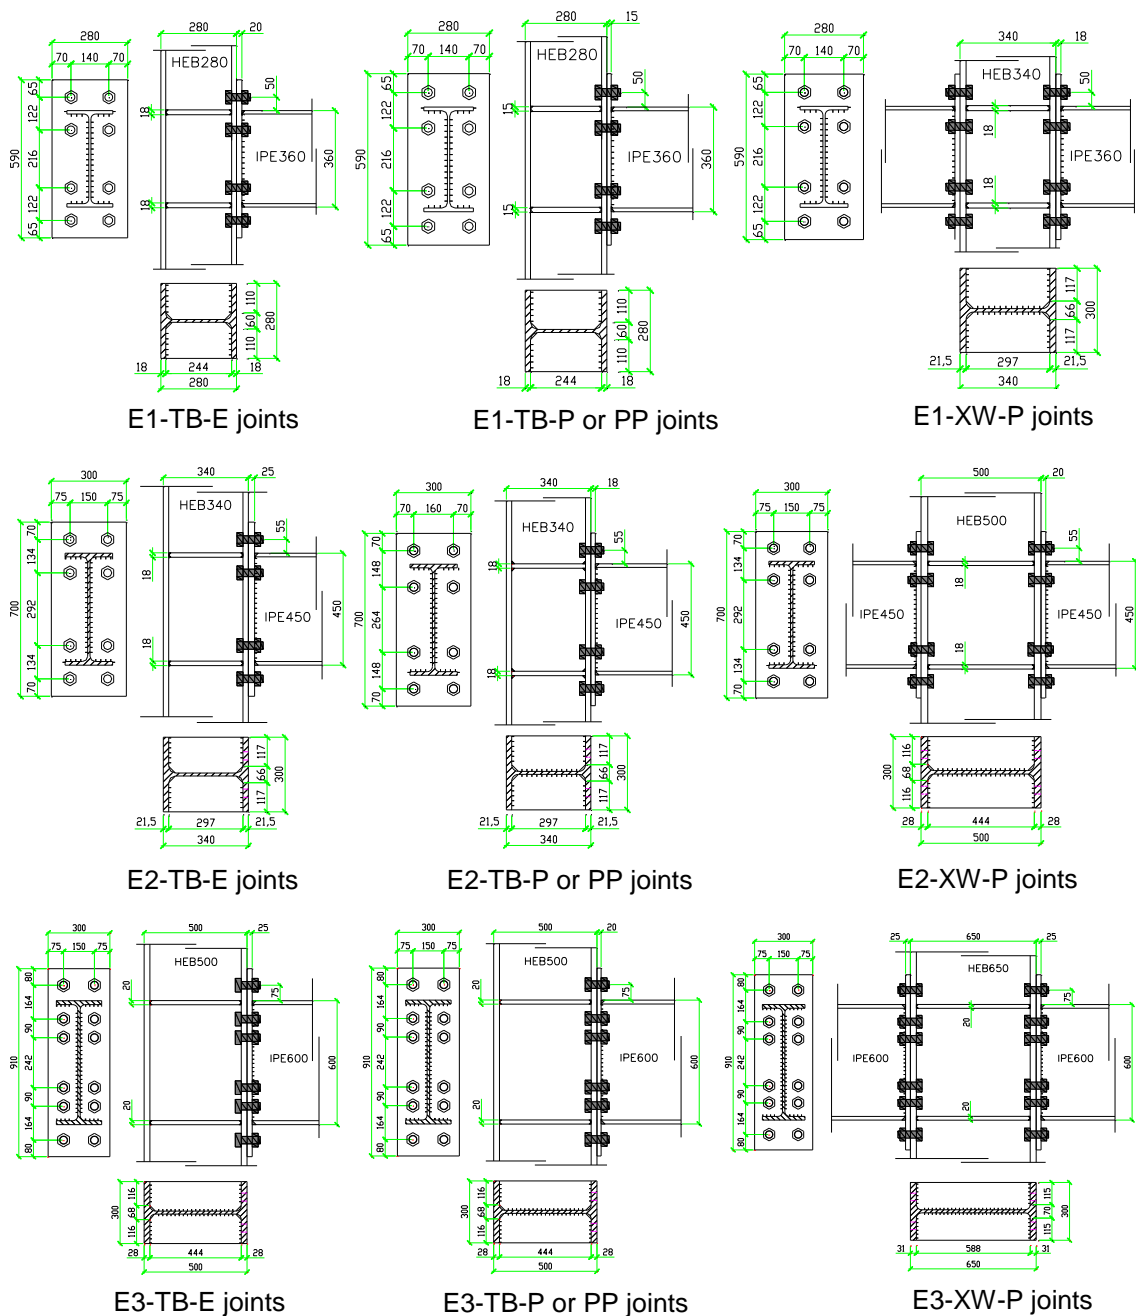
Main properties of the unstiffened extended end-plate beam-to-column joint configurations.
